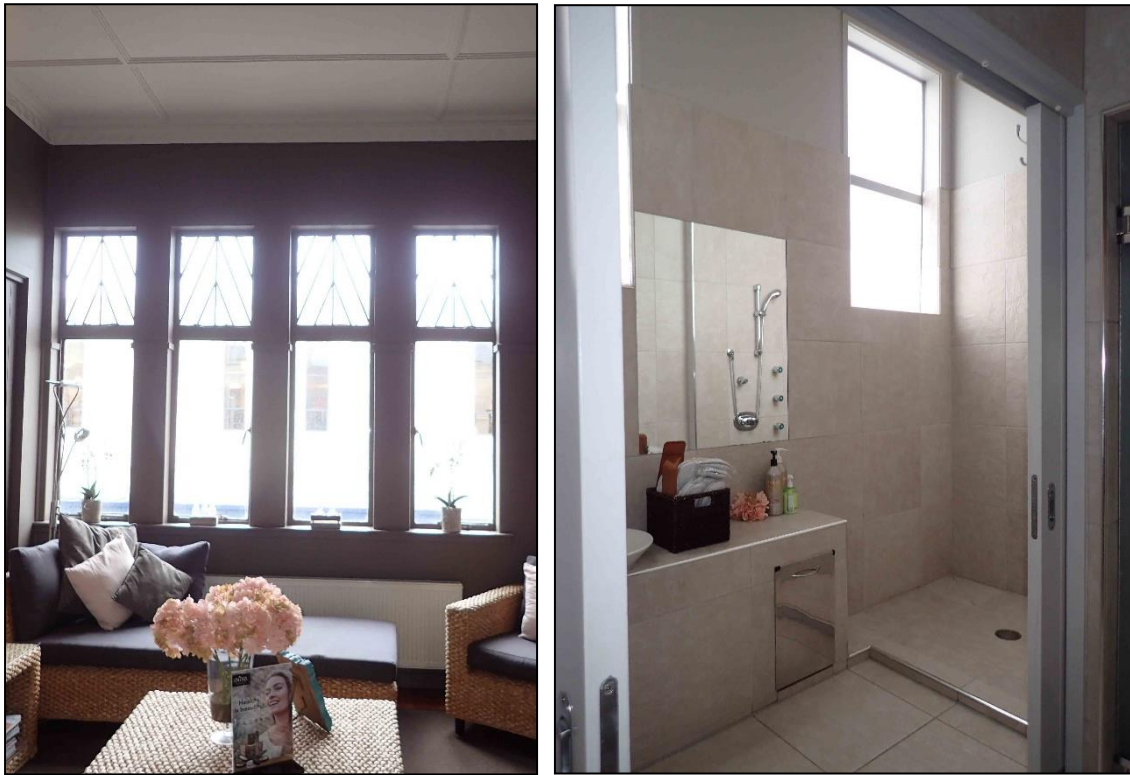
Windows found in the east (left) and west (right) elevations.
